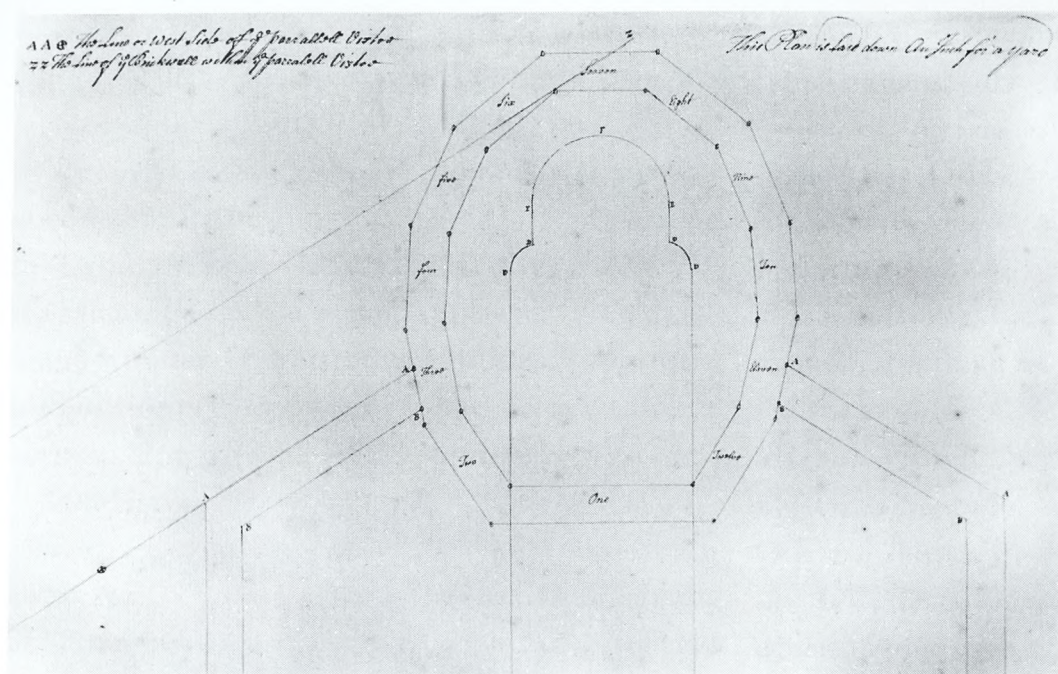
John Hallam, proposed plan of the cold bath showing the summer house as a dodecagon. *Nottinghamshire Archives.
